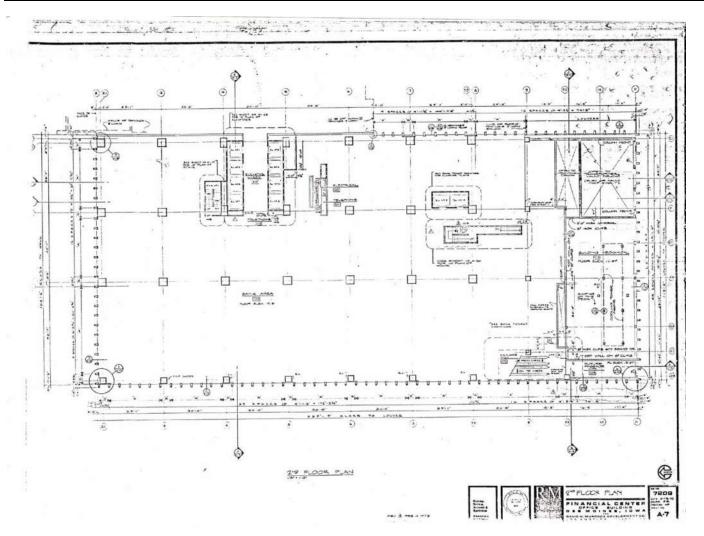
Historic drawing of west wing second-floor shell and core plan, oriented with plan north at left. (Financial Center Office Building drawings, Russell McCaleb, architect, Guirey, Srnka, Arnold & Sprinkler associated architects).
